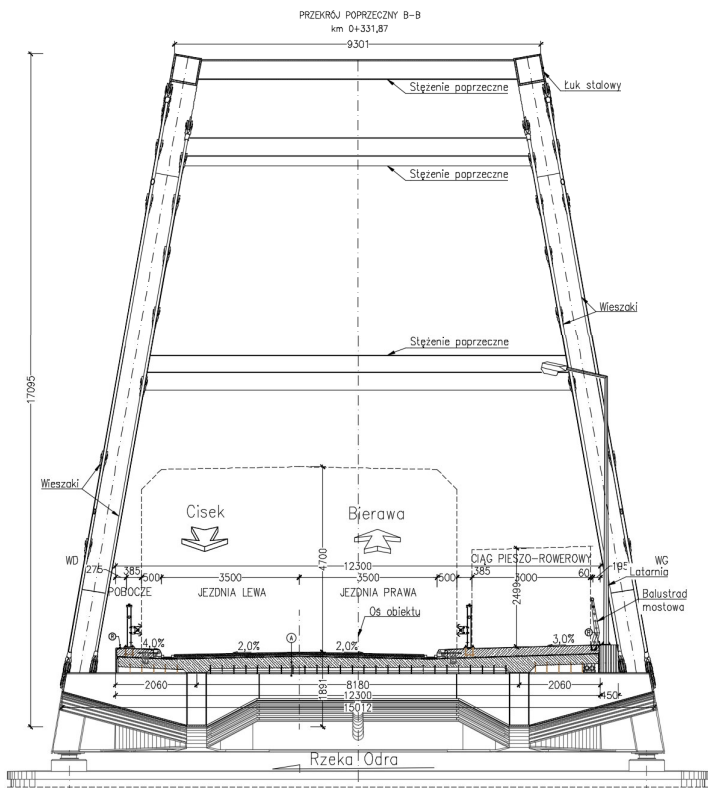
Cross section of a new-designed bridge in a mid-span of arch span.
